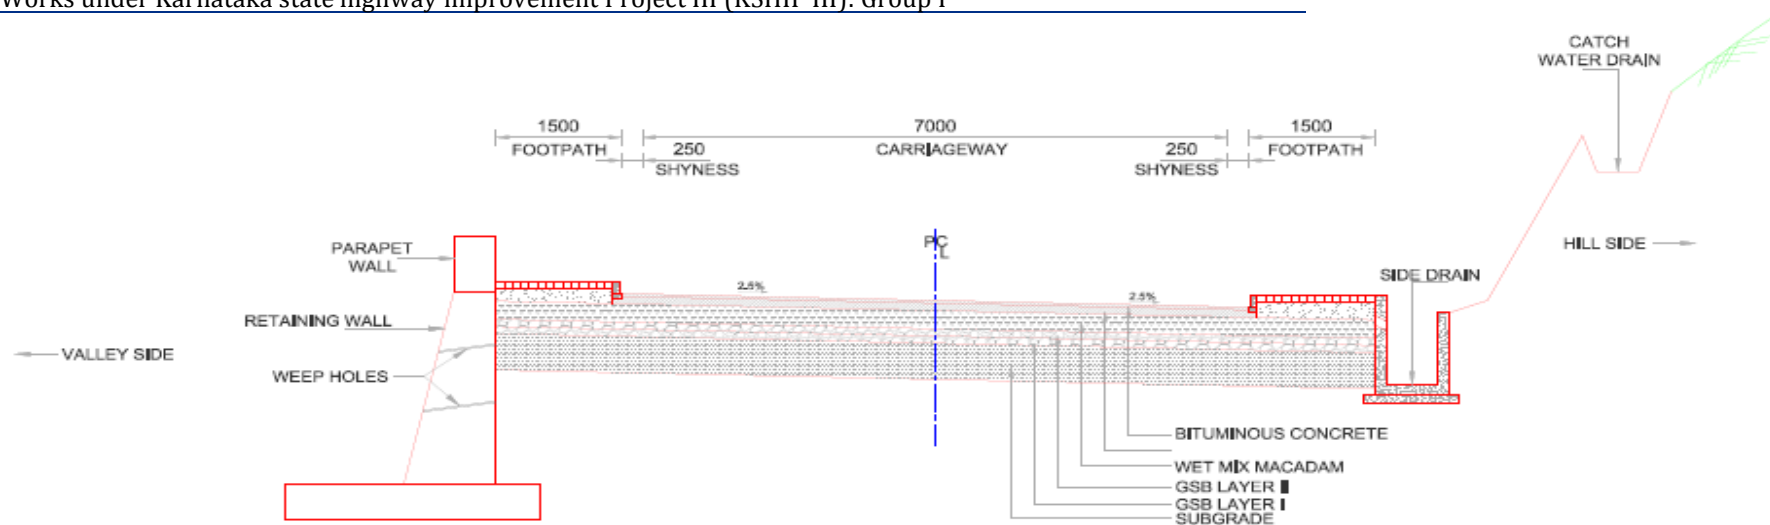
TCS-12 Two lane Carriageway with footpath, retaining wall & Parapet in Hill/Ghat section built-up areas
